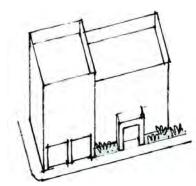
Mixed use area buildings with 0 to 5 feet street facing setback
